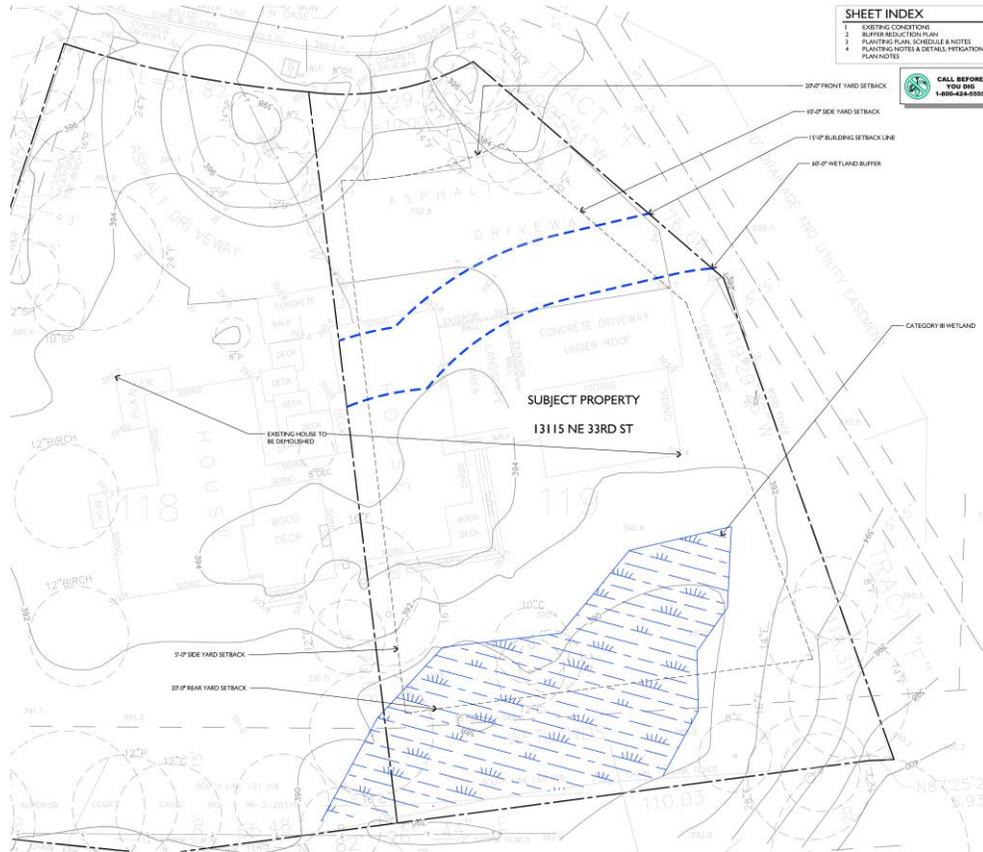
Site Plan with Critical Area and Standard 60' Buffer
